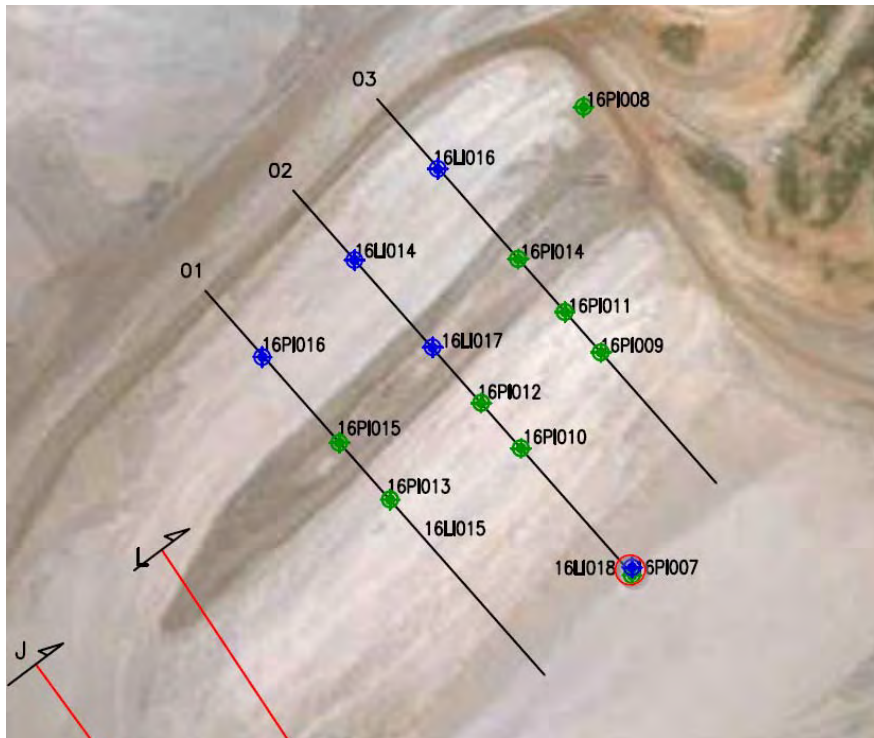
Zoom of Samarco instrumentation plan showing 16LI018
